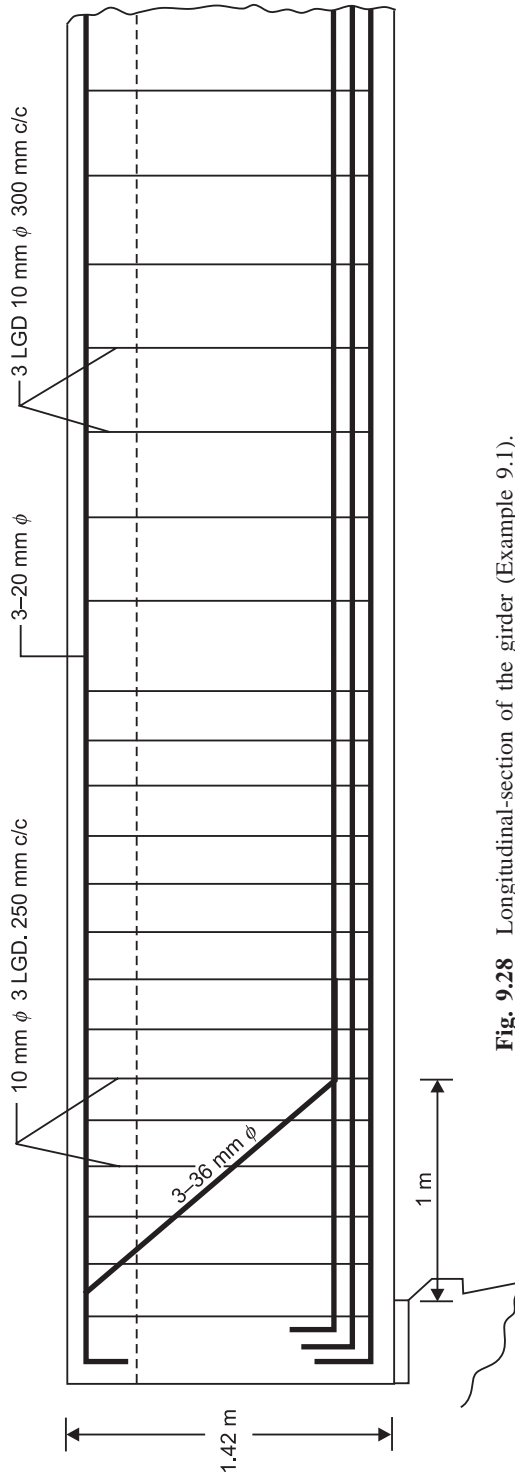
Longitudinal-section of the girder (Example 9.1).
